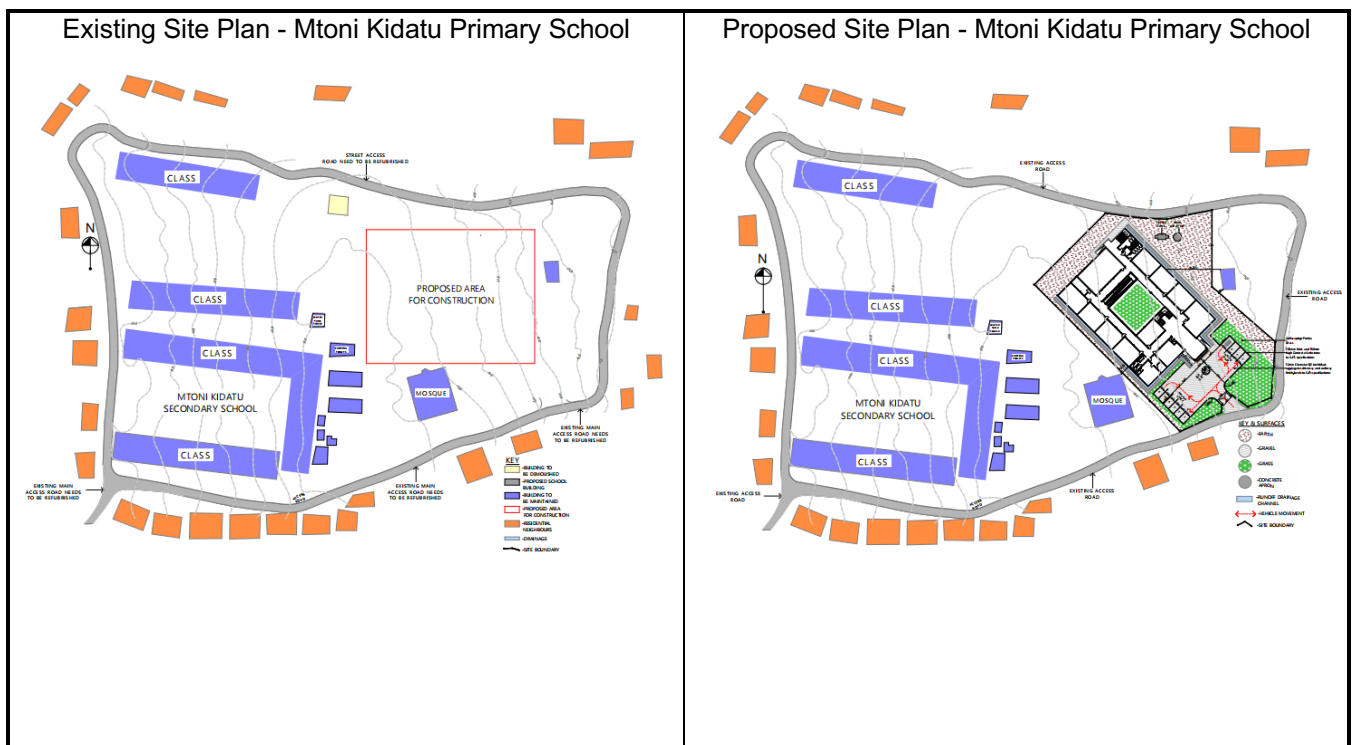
Existing buildings against the proposed new buildings for the targeted schools
